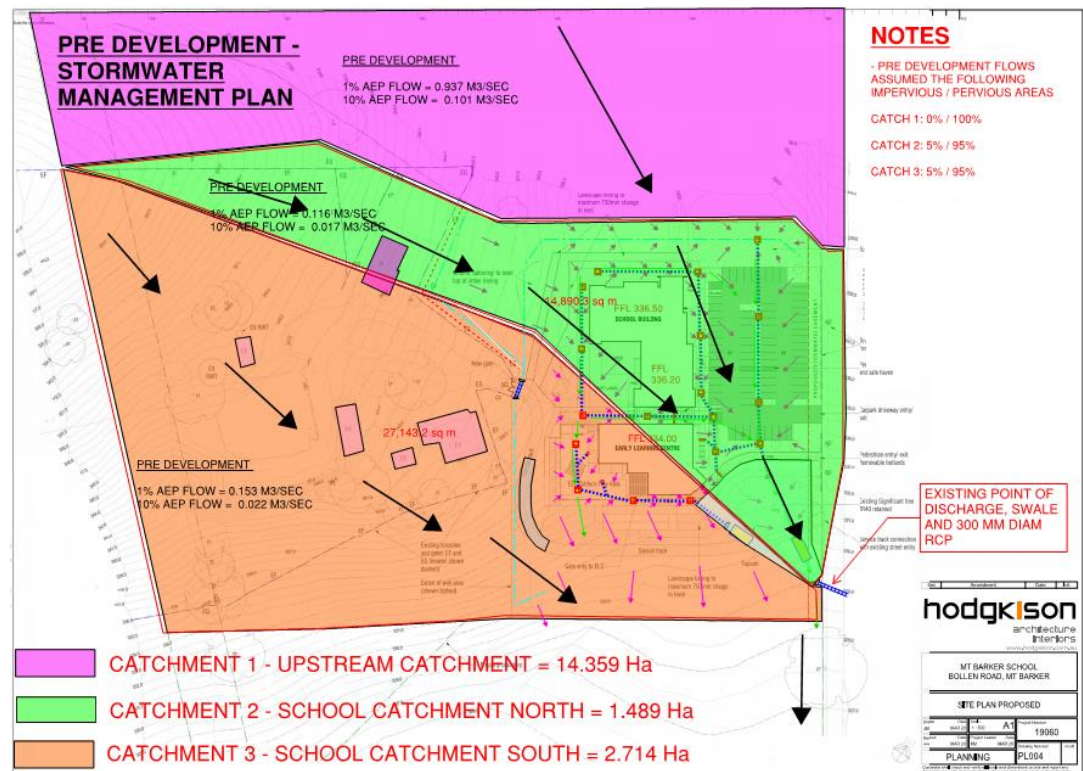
pre-development site catchment plan (site layout shown indicative only, refer architect plans for current)
